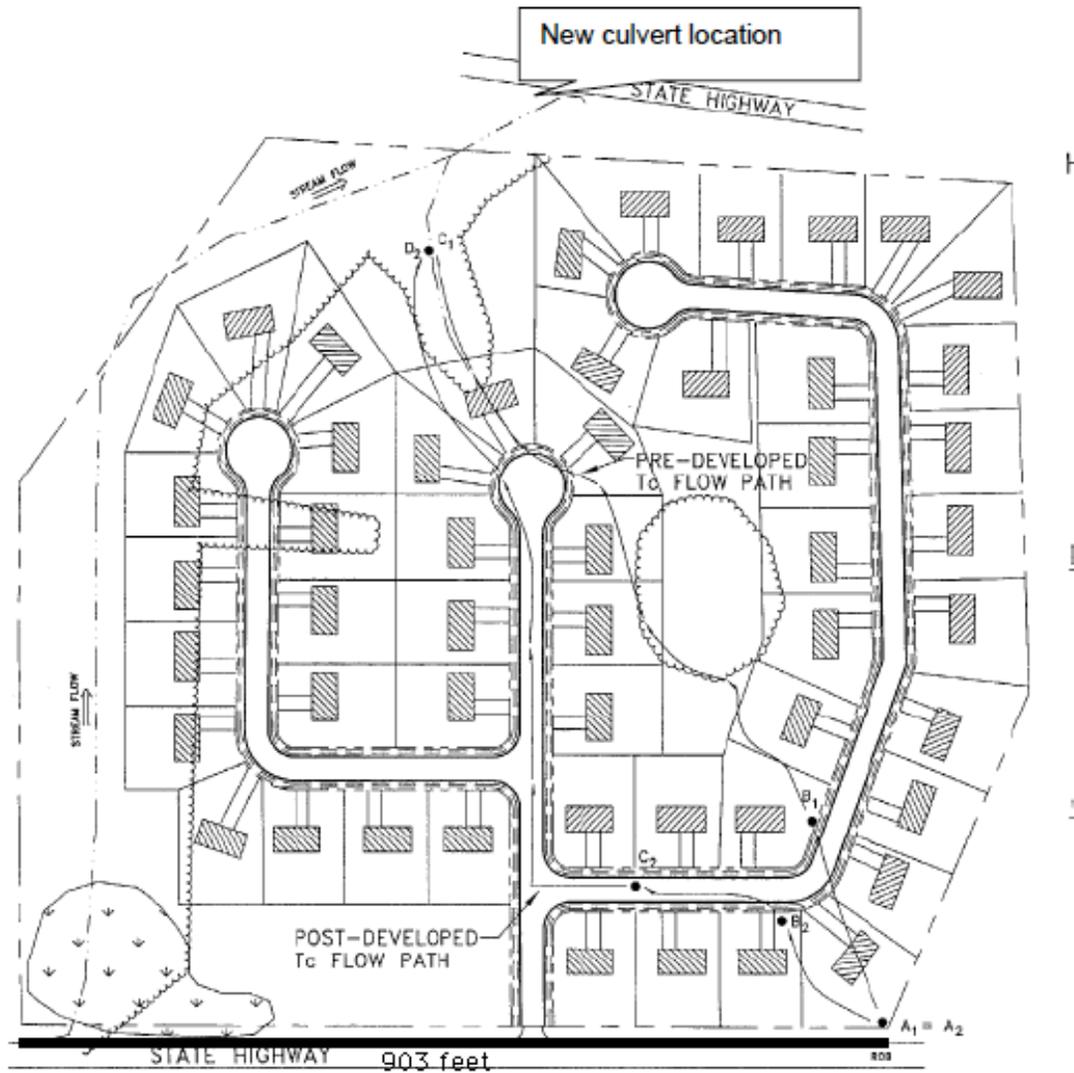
Subdivision X Drainage to a Highway Culvert
